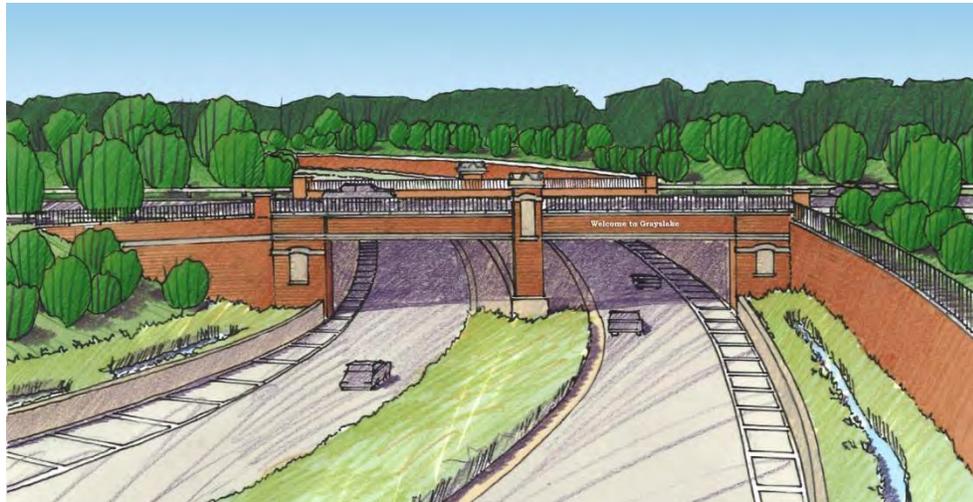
Bridge Rendering Matching Grayslake's Architectural Style
